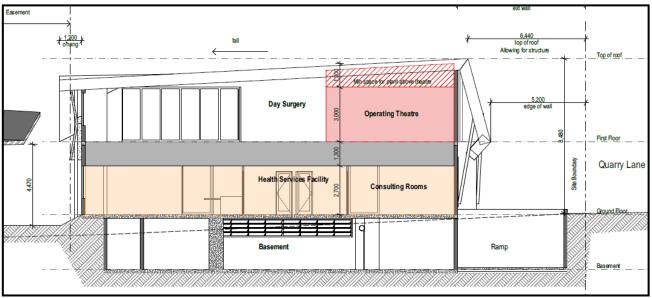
Section drawing showing 1.3m area above both ground floor consulting rooms and first floor operating theatre
